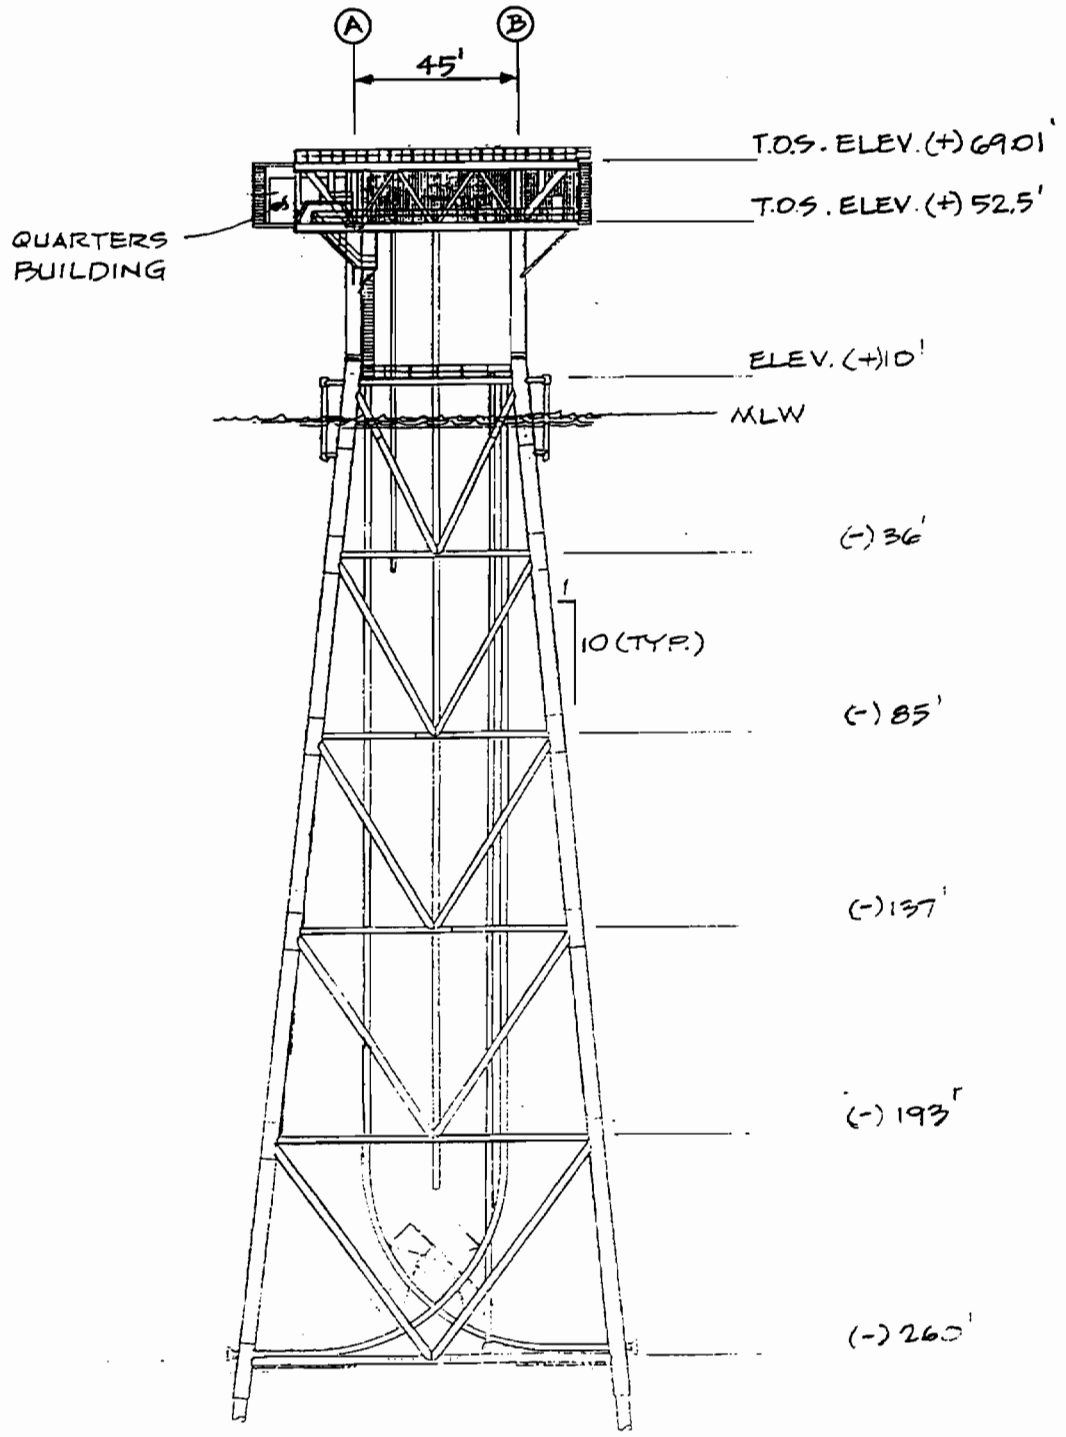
ENDON ELEVATION - ROW 1 and 4
